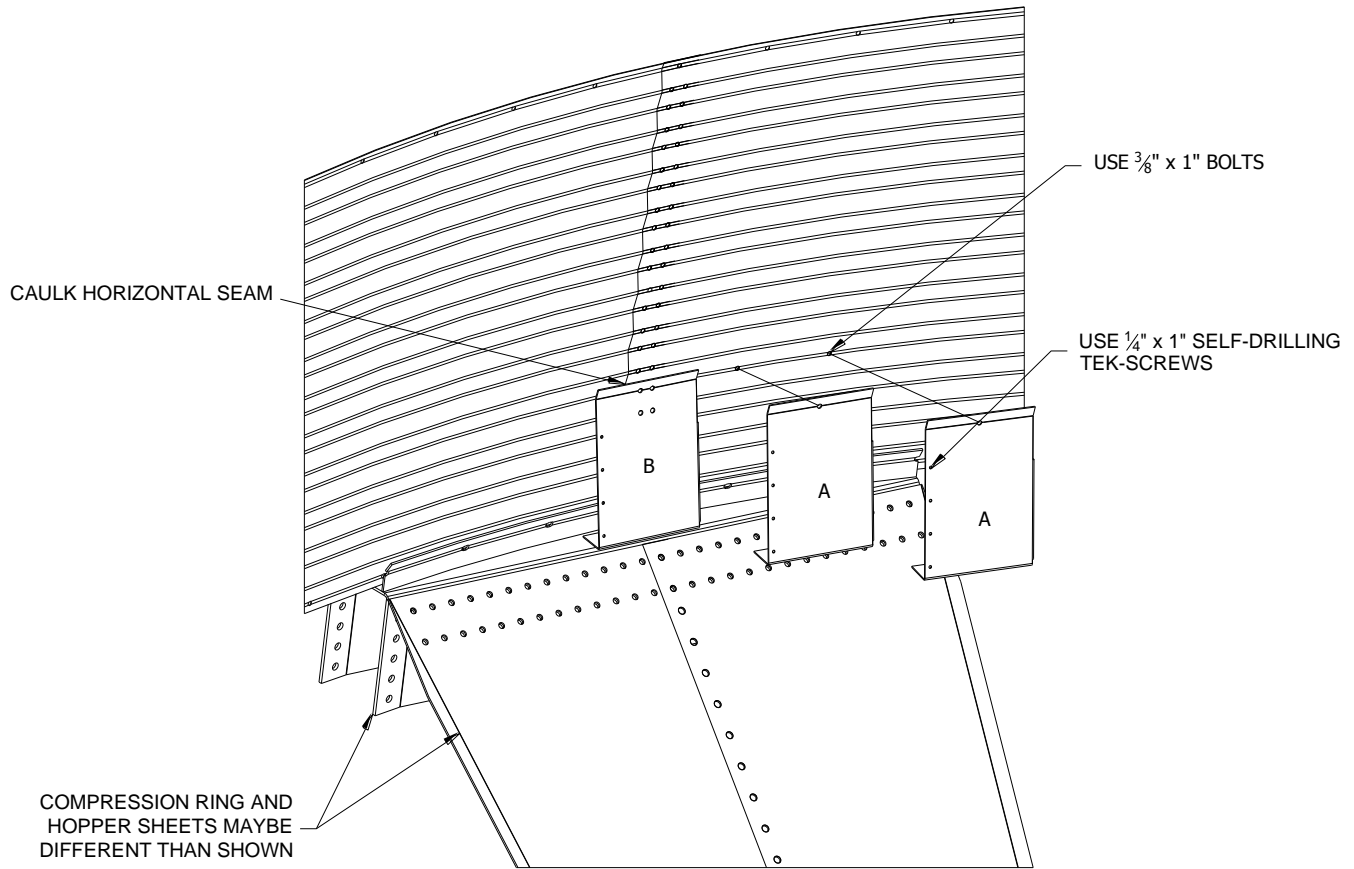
Connection Detail for 36' Upper Hopper Sheets
